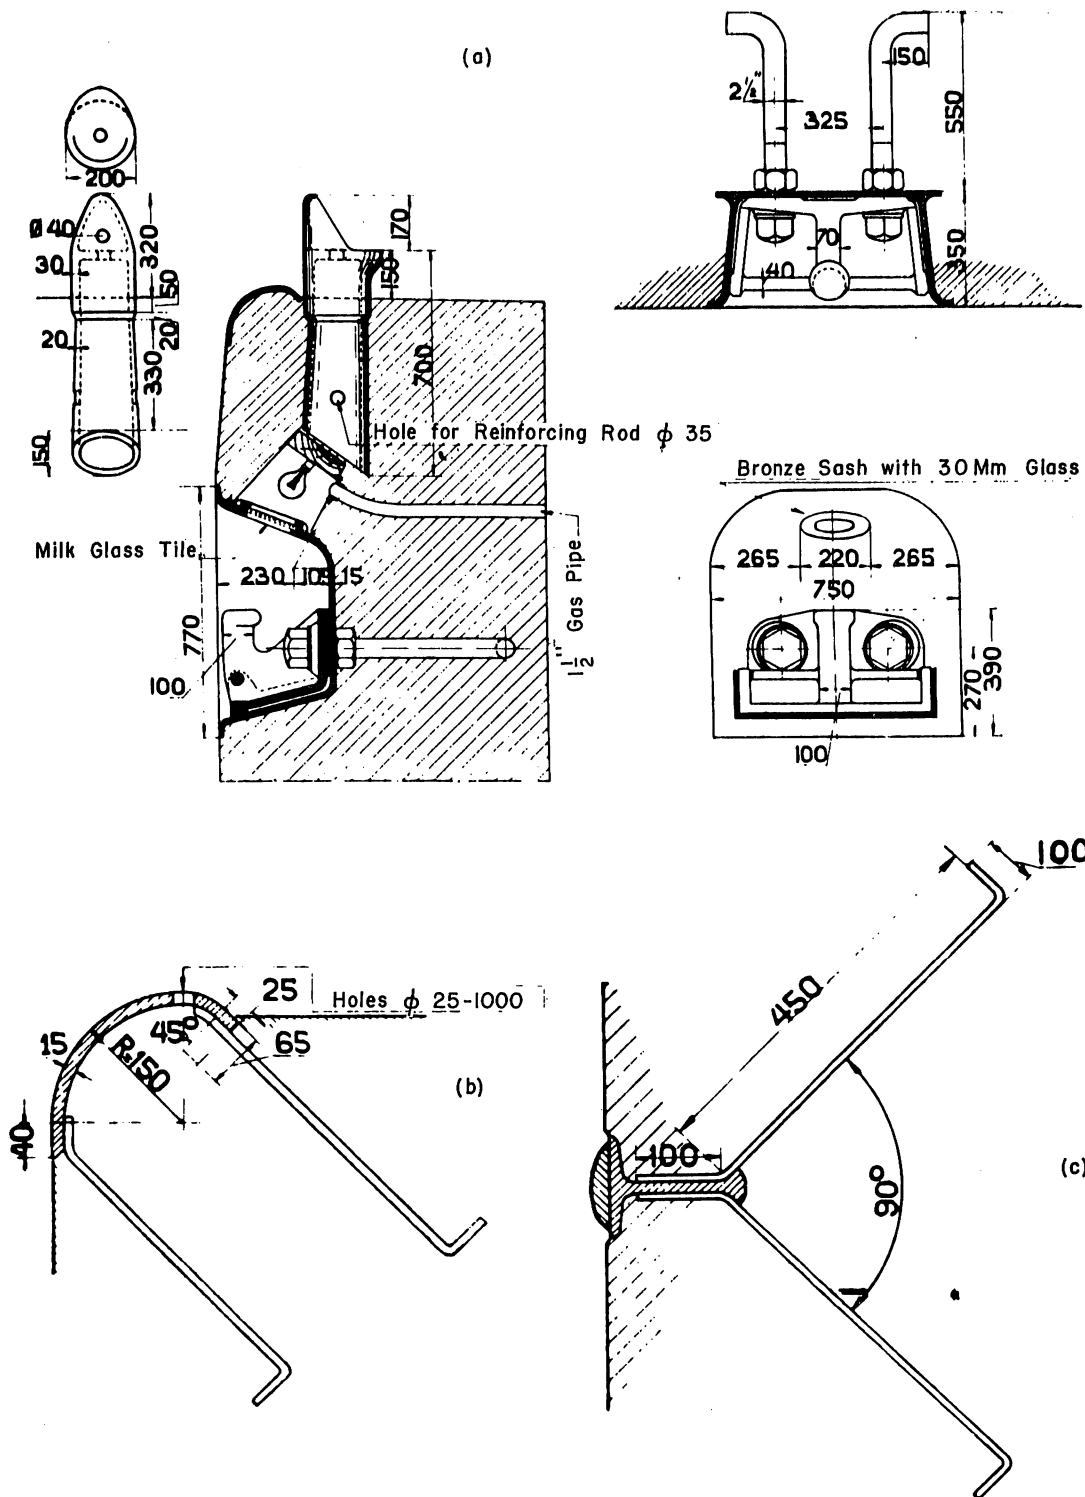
(a) Mooring Bits and Niches; (b) Rounded Deck Slab Profile; (c) Steel Bumpers
